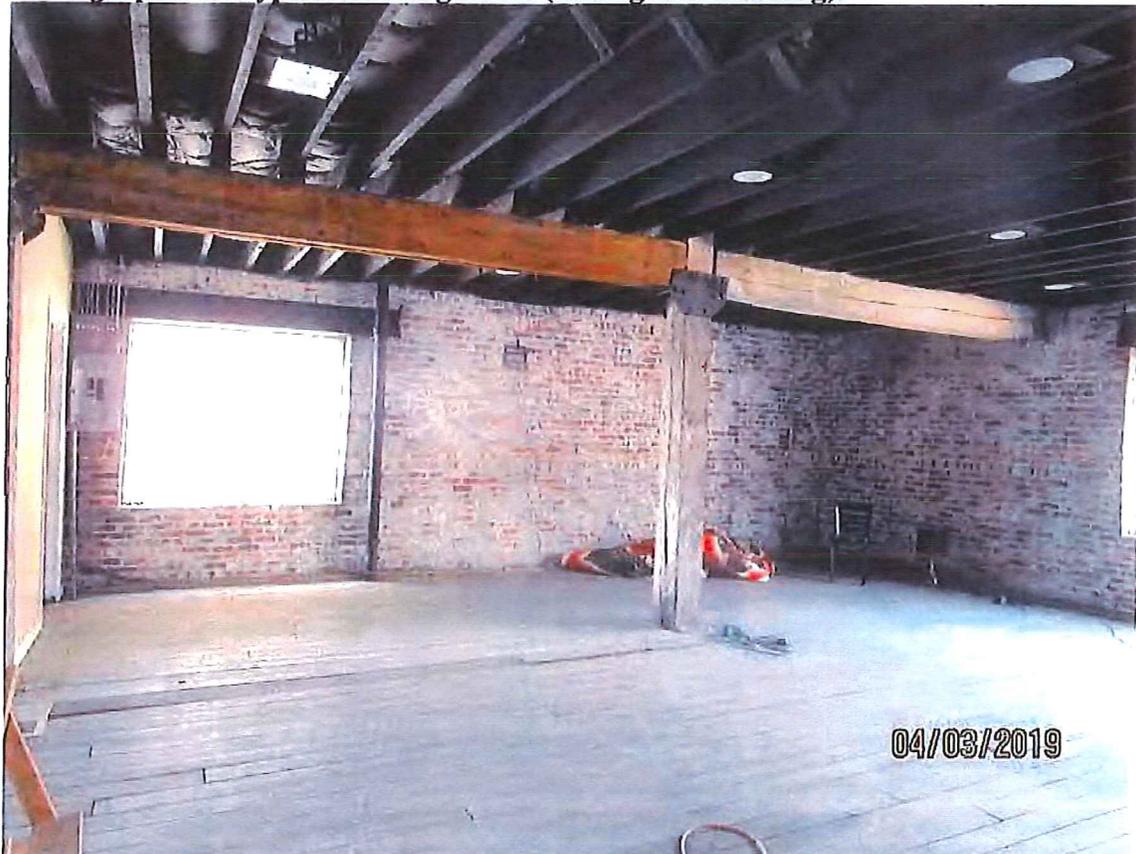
Lack of bearing of floor joists at left sidewall.
